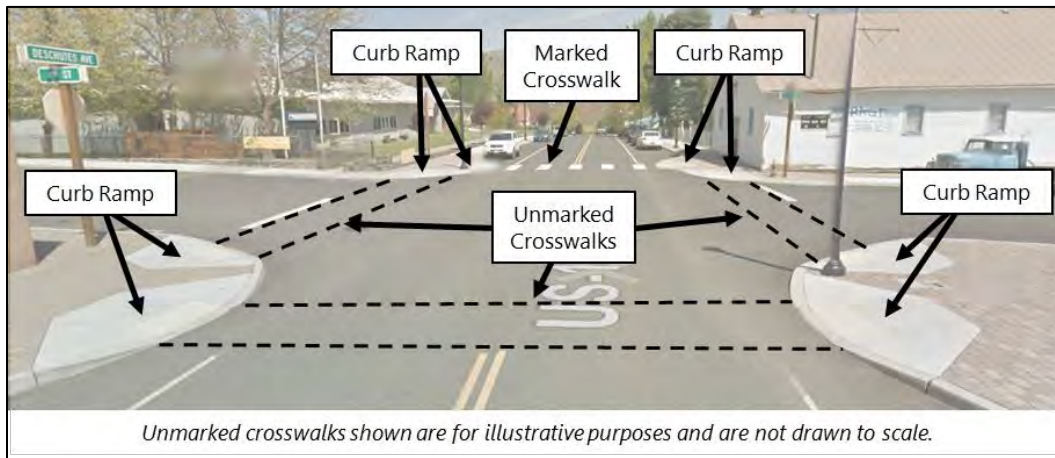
Unmarked Crosswalk Location where Curb Ramp and Shoulder Connect
